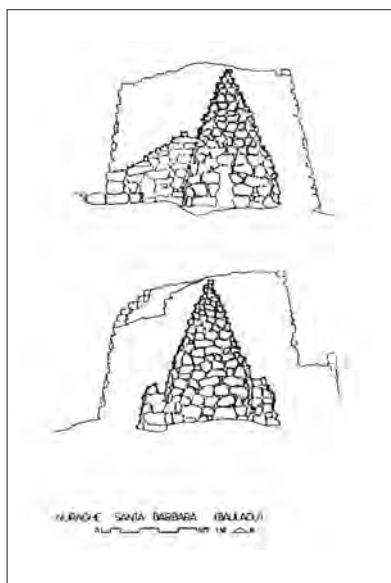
Bauladu (OR), S. Barbara : cross-sections of the central tower of the nuraghe (after Gallin, Tykot 1993).
